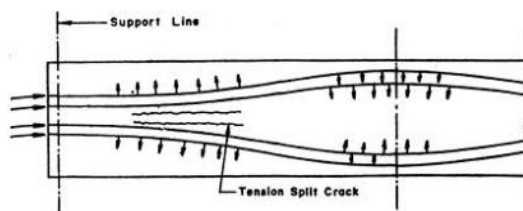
Plan sketch of tension split cracks in PSC super-structure
